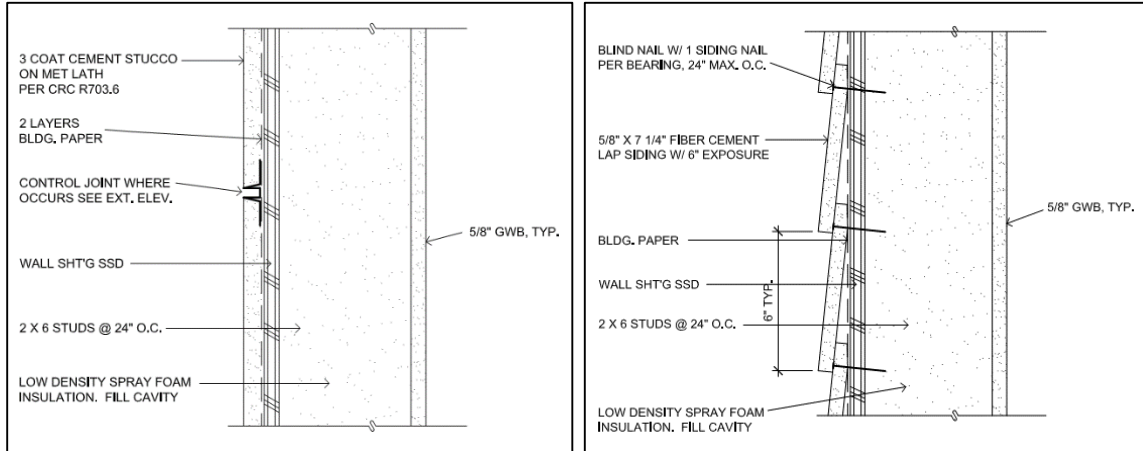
Wall details with stucco (left) and fiber cement siding (right)
